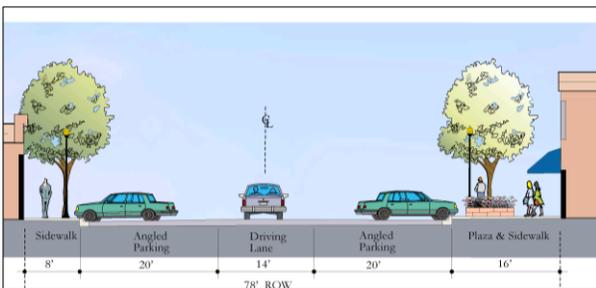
Elm Street Cross Section – Angled Parking Both Sides
